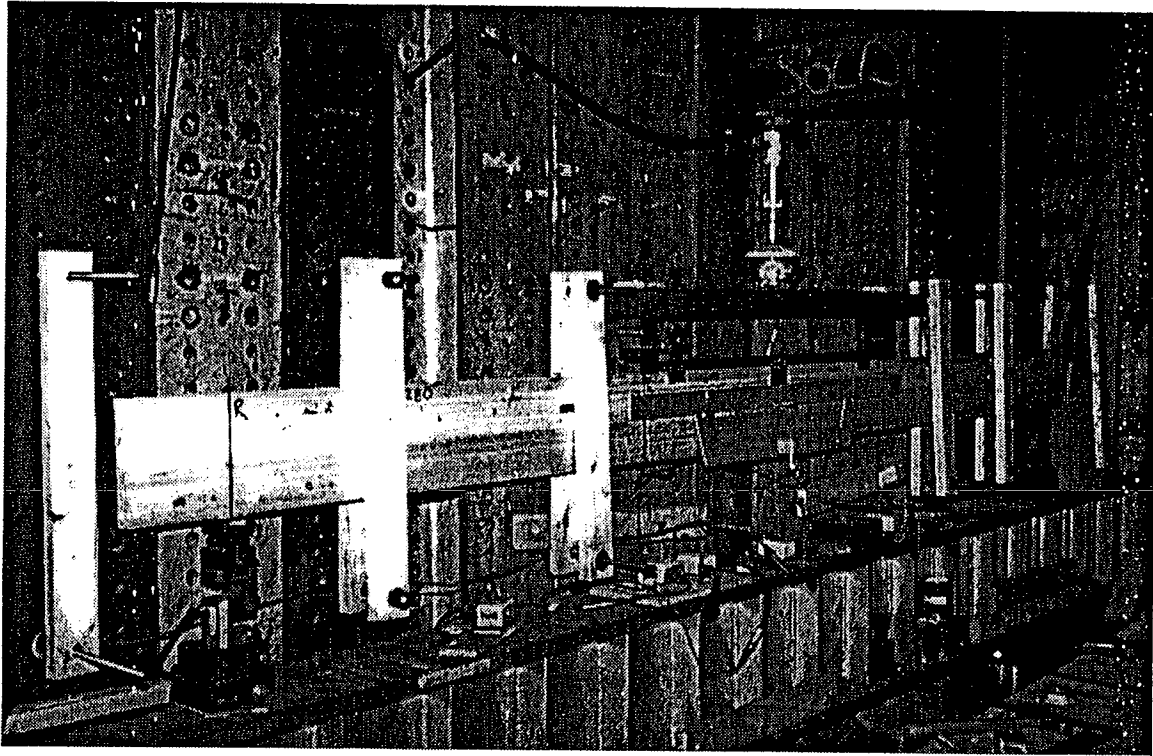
Typical Specimen From Supplier Placed in Test Set Up
